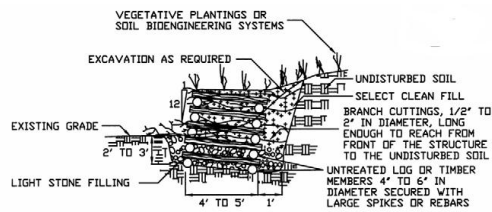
Typical live crib wall cross-section (NYS DEC, 2005).
